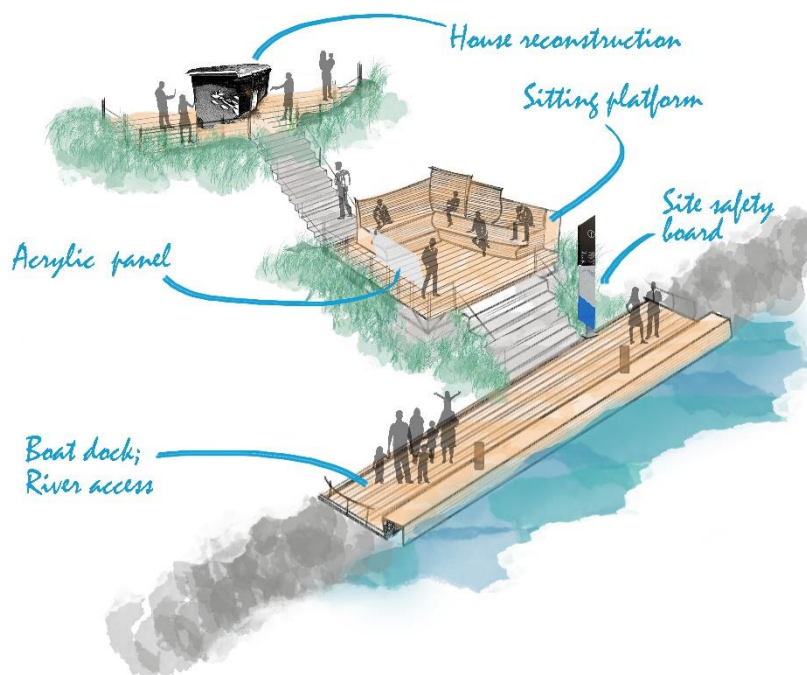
Proposed site construction with boat dock, resting benches, walking platforms and Mesolithic house.
